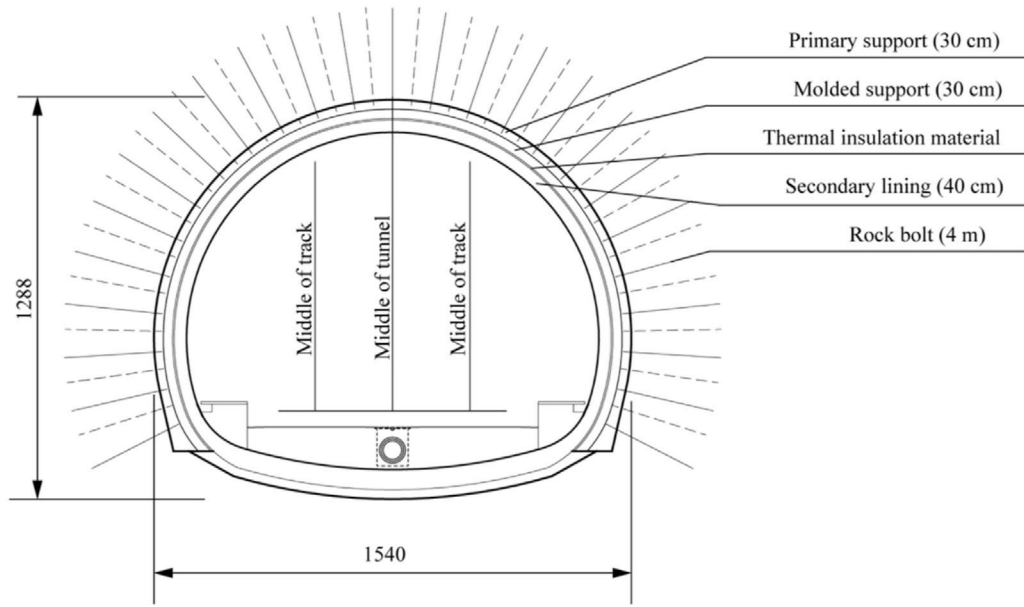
Typical shape of tunnel structure. (Unit: cm)
